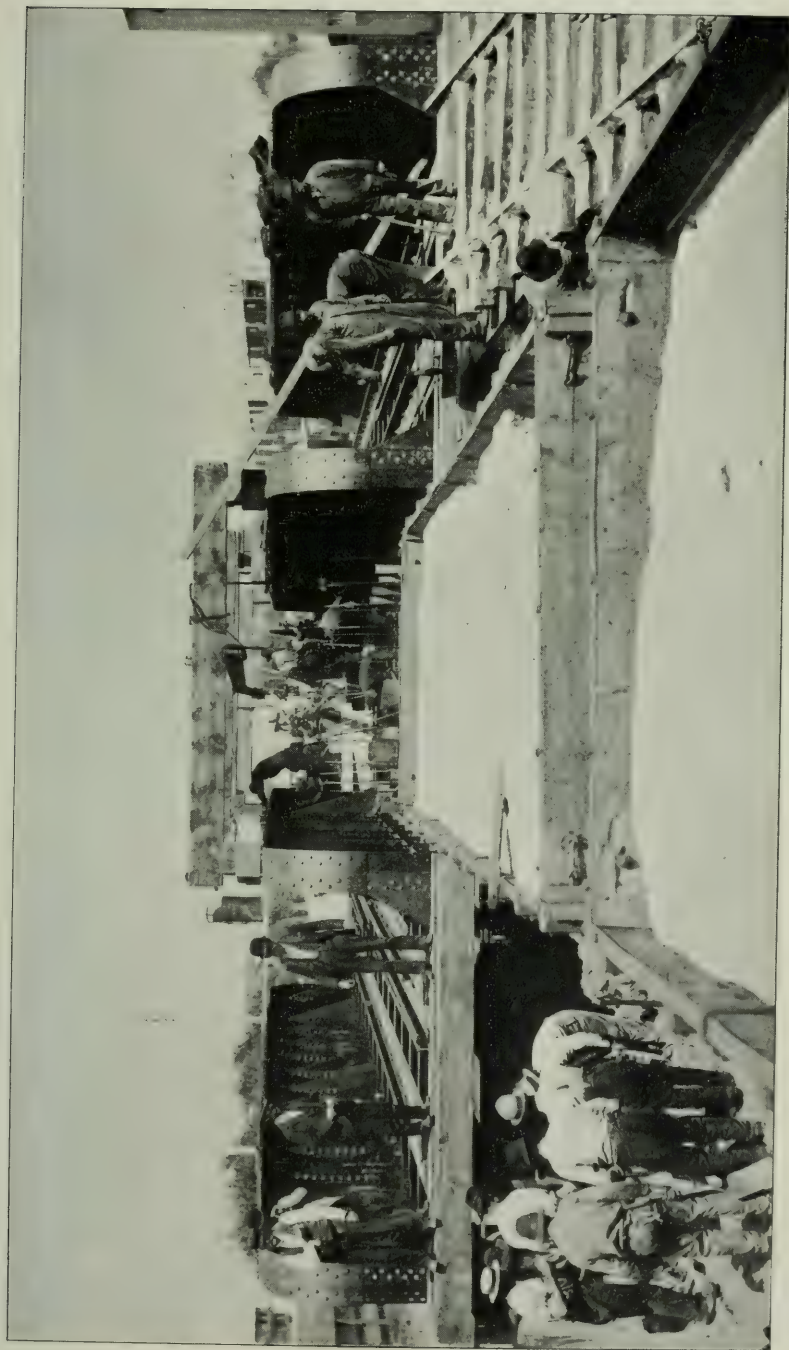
INTERMEDIATE FLOOR BEING PUT IN BETWEEN TWO BRIDGES AT HOMAN AVE., ALSO SAND FILLING FOR APPROACHES.
